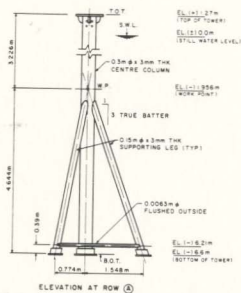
The fabrication drawing describing the front elevation of the tower
